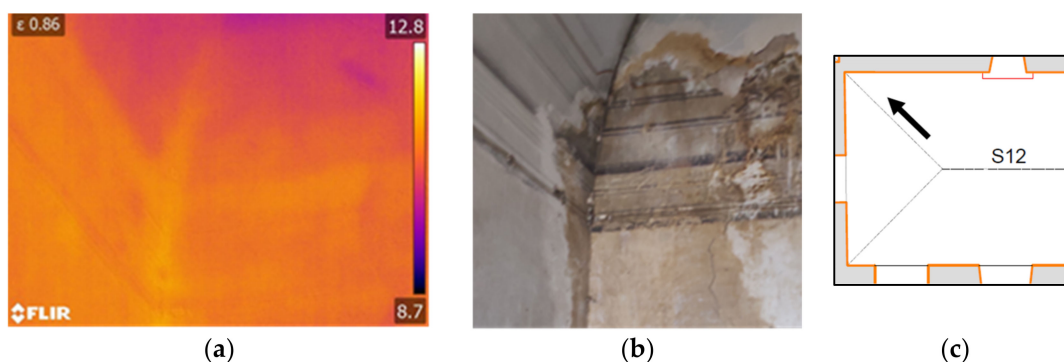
Room S12-bis: (a) infrared image, (b) photography view and (c) plan view.
